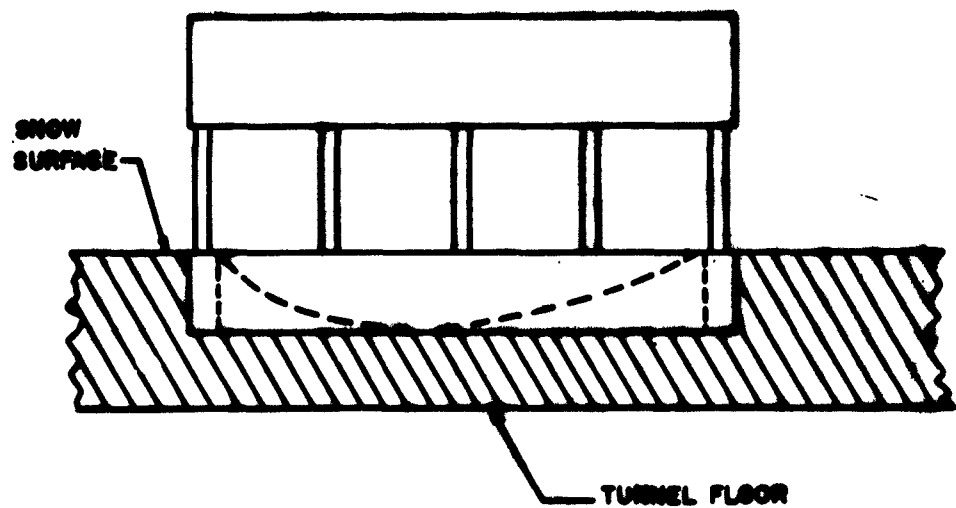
Schematic view of foundation used to support radar type building for test rerun.
